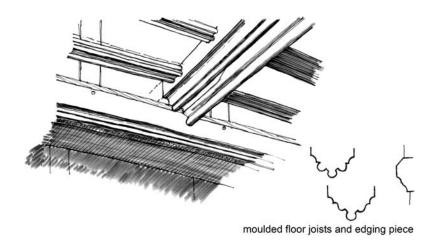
Inserted 16th-century moulded floor in The Goat and Boot, 70 East Hill (corpus no. 15). The moulded edging is attached to the side wall of an earlier cross-wing. The moulded floor-timbers and edging are shown in cross-section (not to scale)
